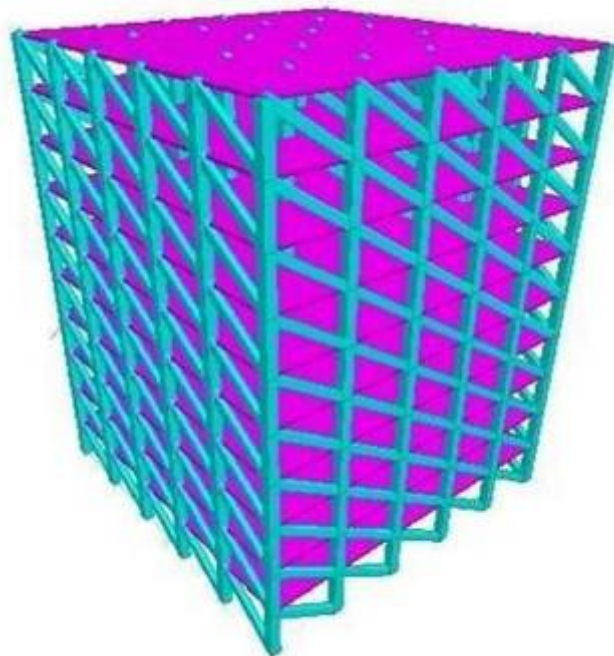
Isometric view of flat slab building having 50 % infill walls
